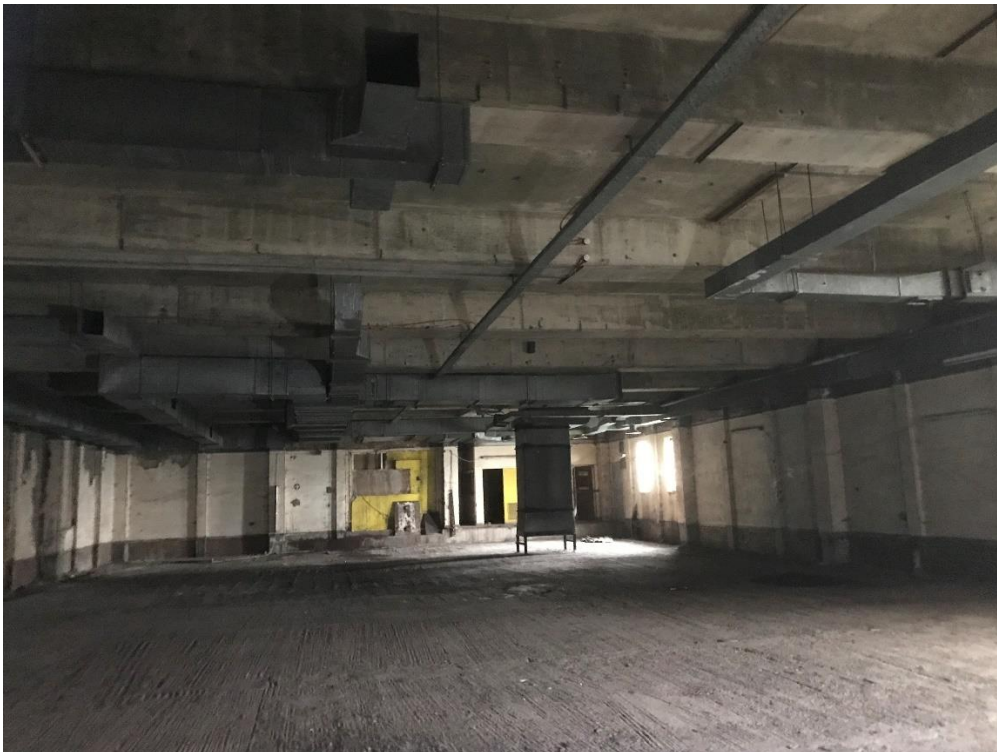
View into one of several comparable storage bays that form the ground floor of Structure B3, all accessed from the exterior
